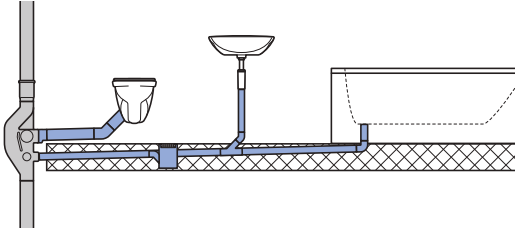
Structure with single branch discharge pipe above the ceiling and collector branch discharge pipe with floor drain in the ceiling
